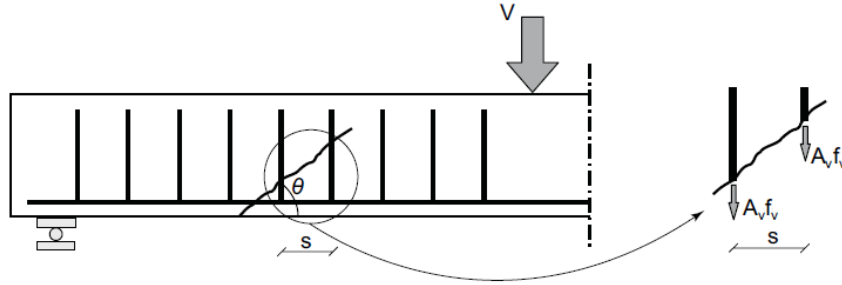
Tensile force transfer across inclined shear cracks through vertical stirrups (fib, 2007)
